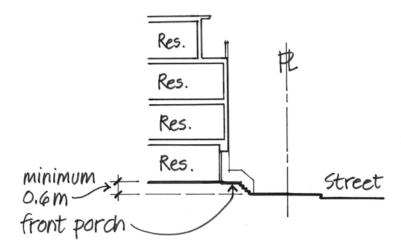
Ground floor residential units facing a street raised a minimum of 0.6 m
